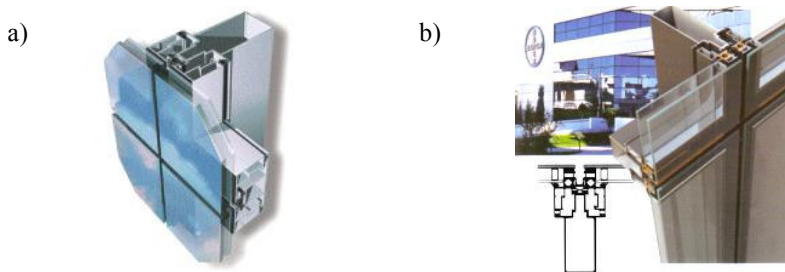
Structural Solar Facade Serial ALUMIL M4
